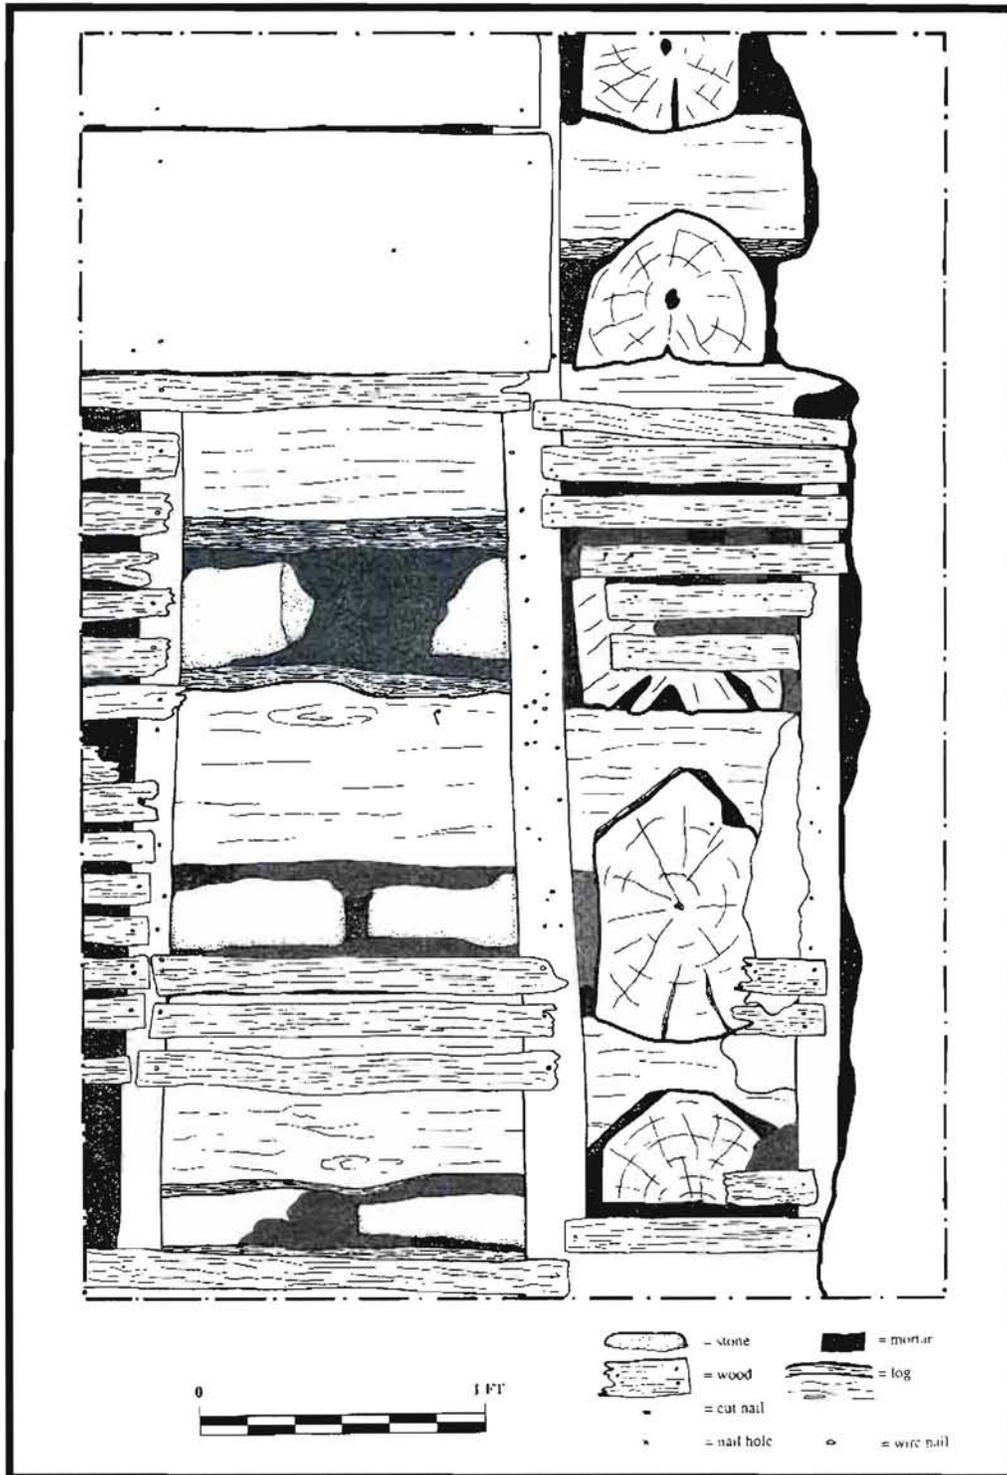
Detail of V-notched Corner Joinery Showing Lath and Vestigial Nail Holes. Illustration documents a small section of the joinery visible on the eastern exterior face of the first floor northeast corner of "Tweed's Tavern". See also Plate 4.25.
